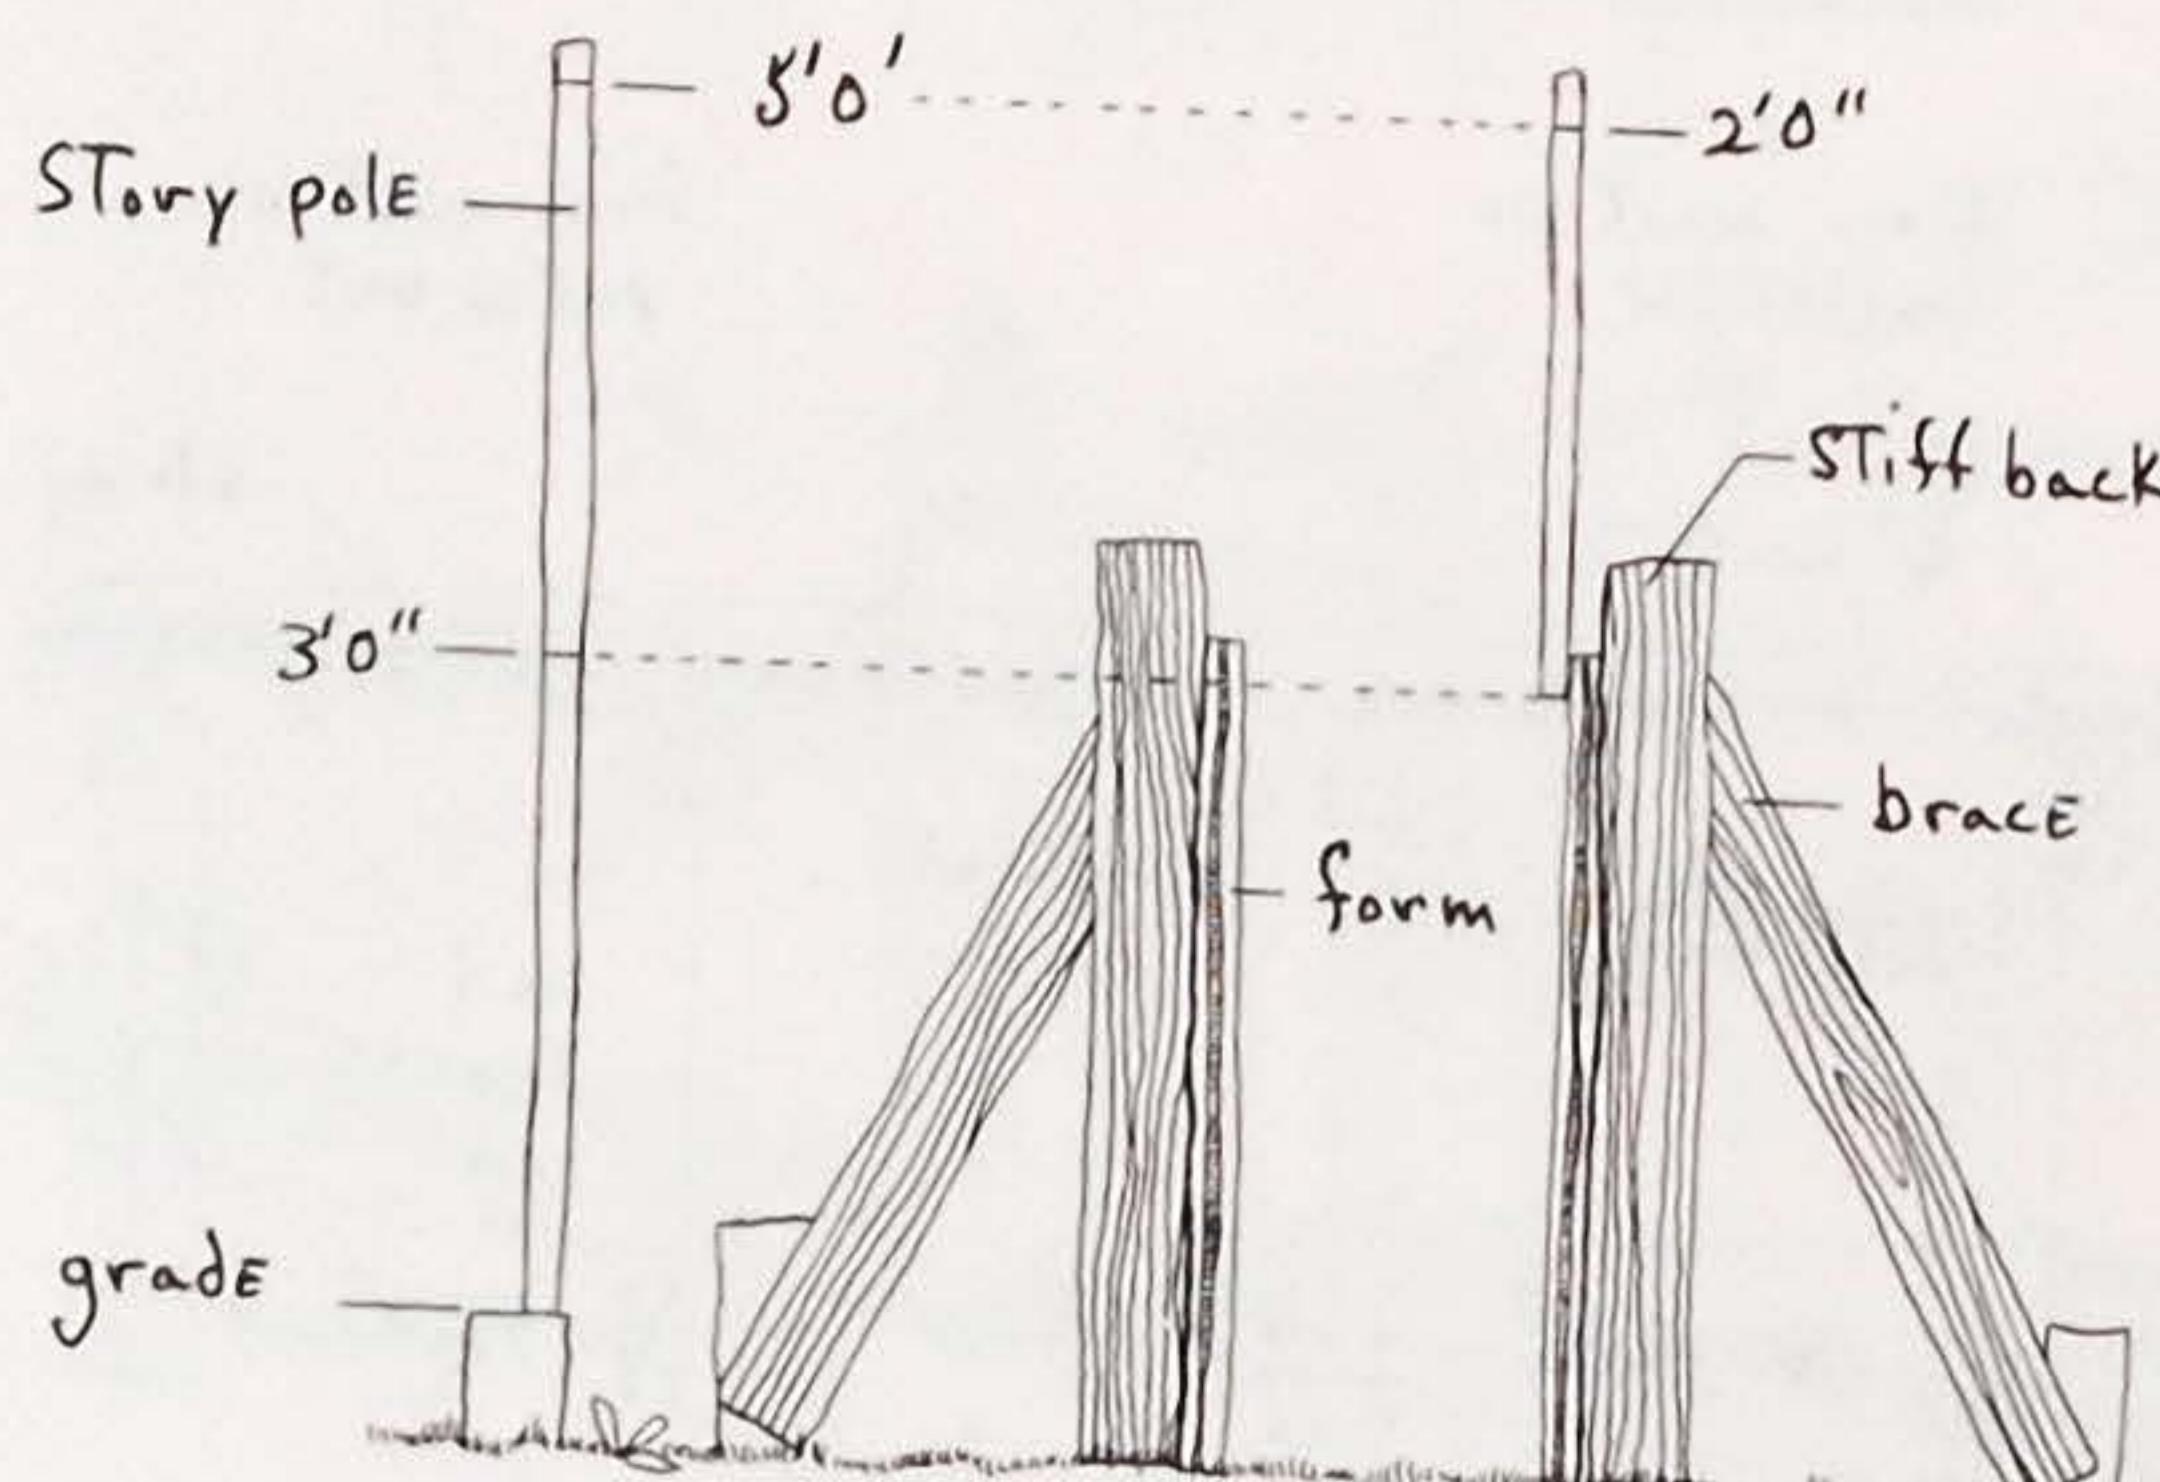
Marking LEVEL of CONCRETE on form Wall
